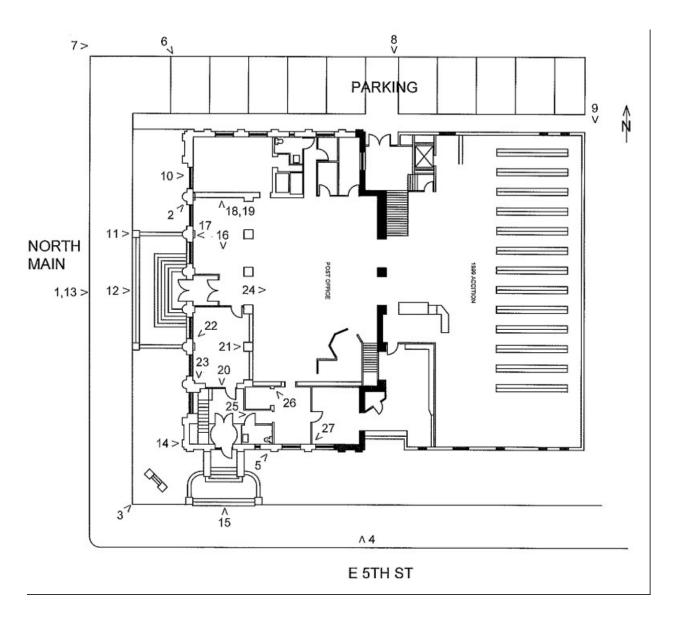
Current Floor Plan, Michales Joy, *Updated First Floor Plan, Maryville Public Library*, 2022. Based on Blueprint, *Maryville Public Library Addition*, Vernon Reed, Reed Architects, 1999.
